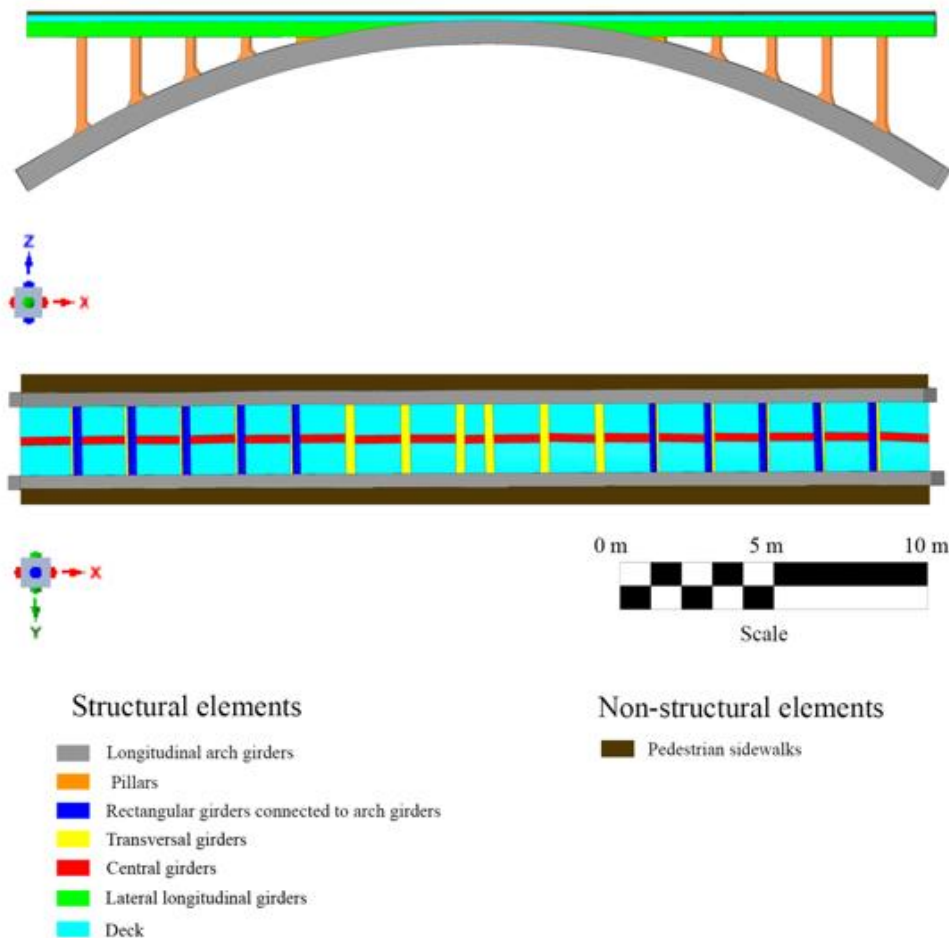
Structural elements and non-structural elements of the Bôco Bridge.
